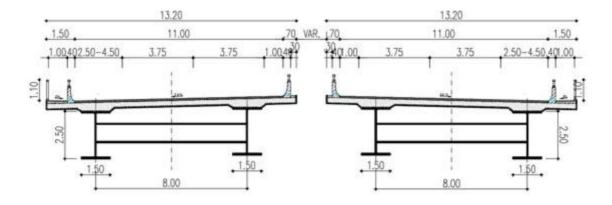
For pre-stressed precast PSC beams bridges – type 2
